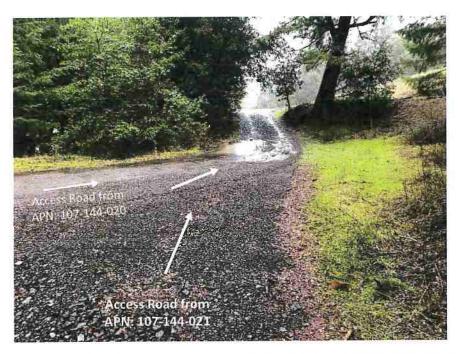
RP 7. Intersection of two private access roads leading from Wilder Ridge Road. Phot taken facing north.
